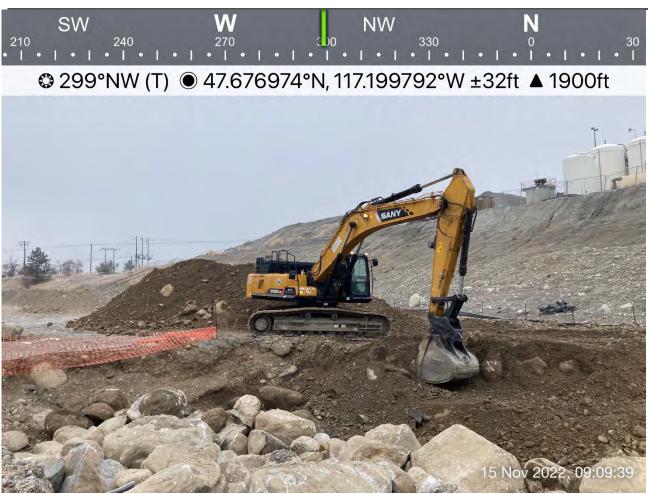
Excvation #8 & #9 facing northwest 4-feet deep.
